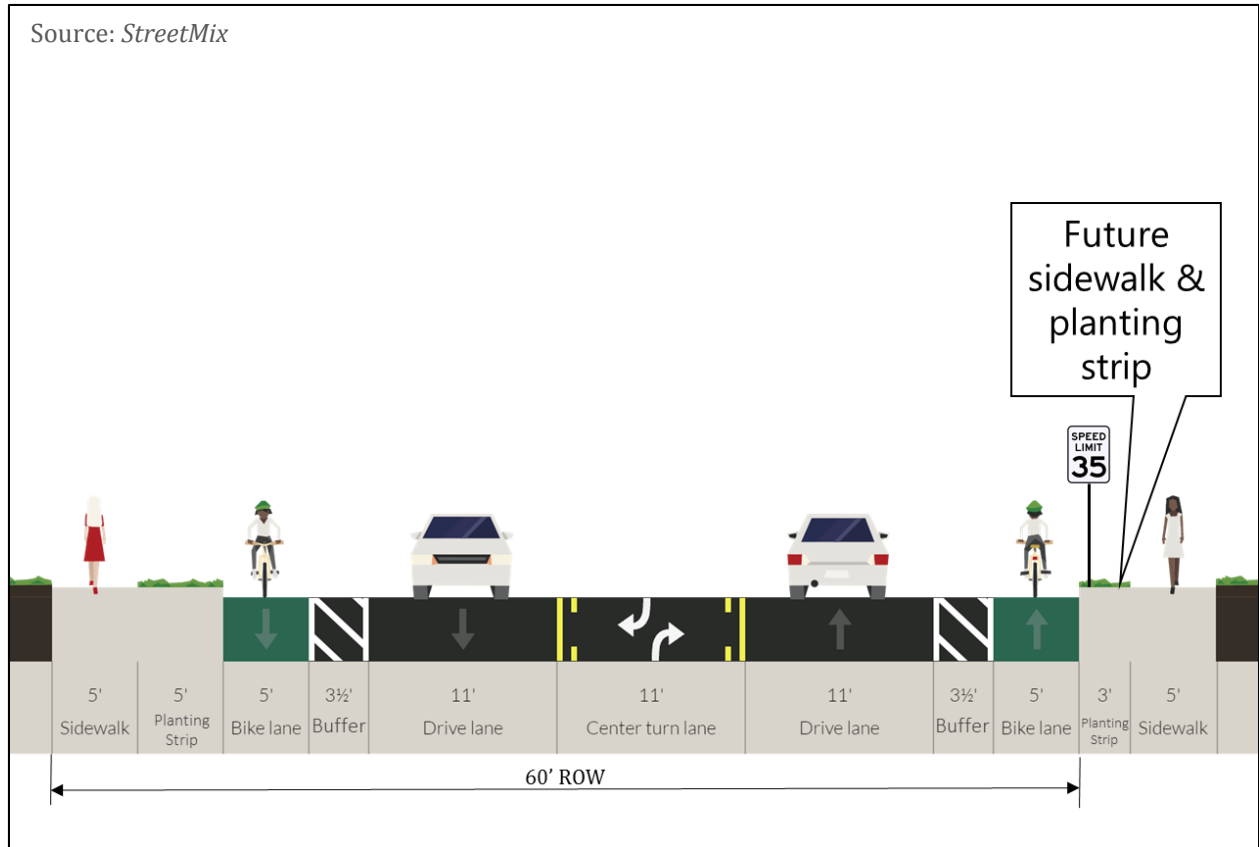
SR 28 Recommended Roadway Typical Section - 60' ROW
